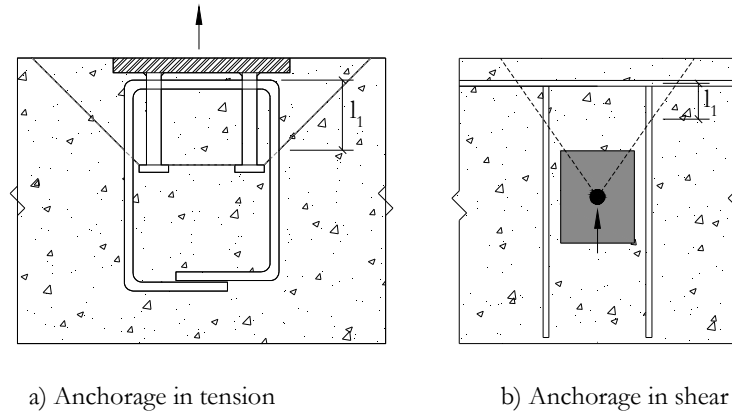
Examples of the application of the hanger reinforcement in anchorage in concrete
